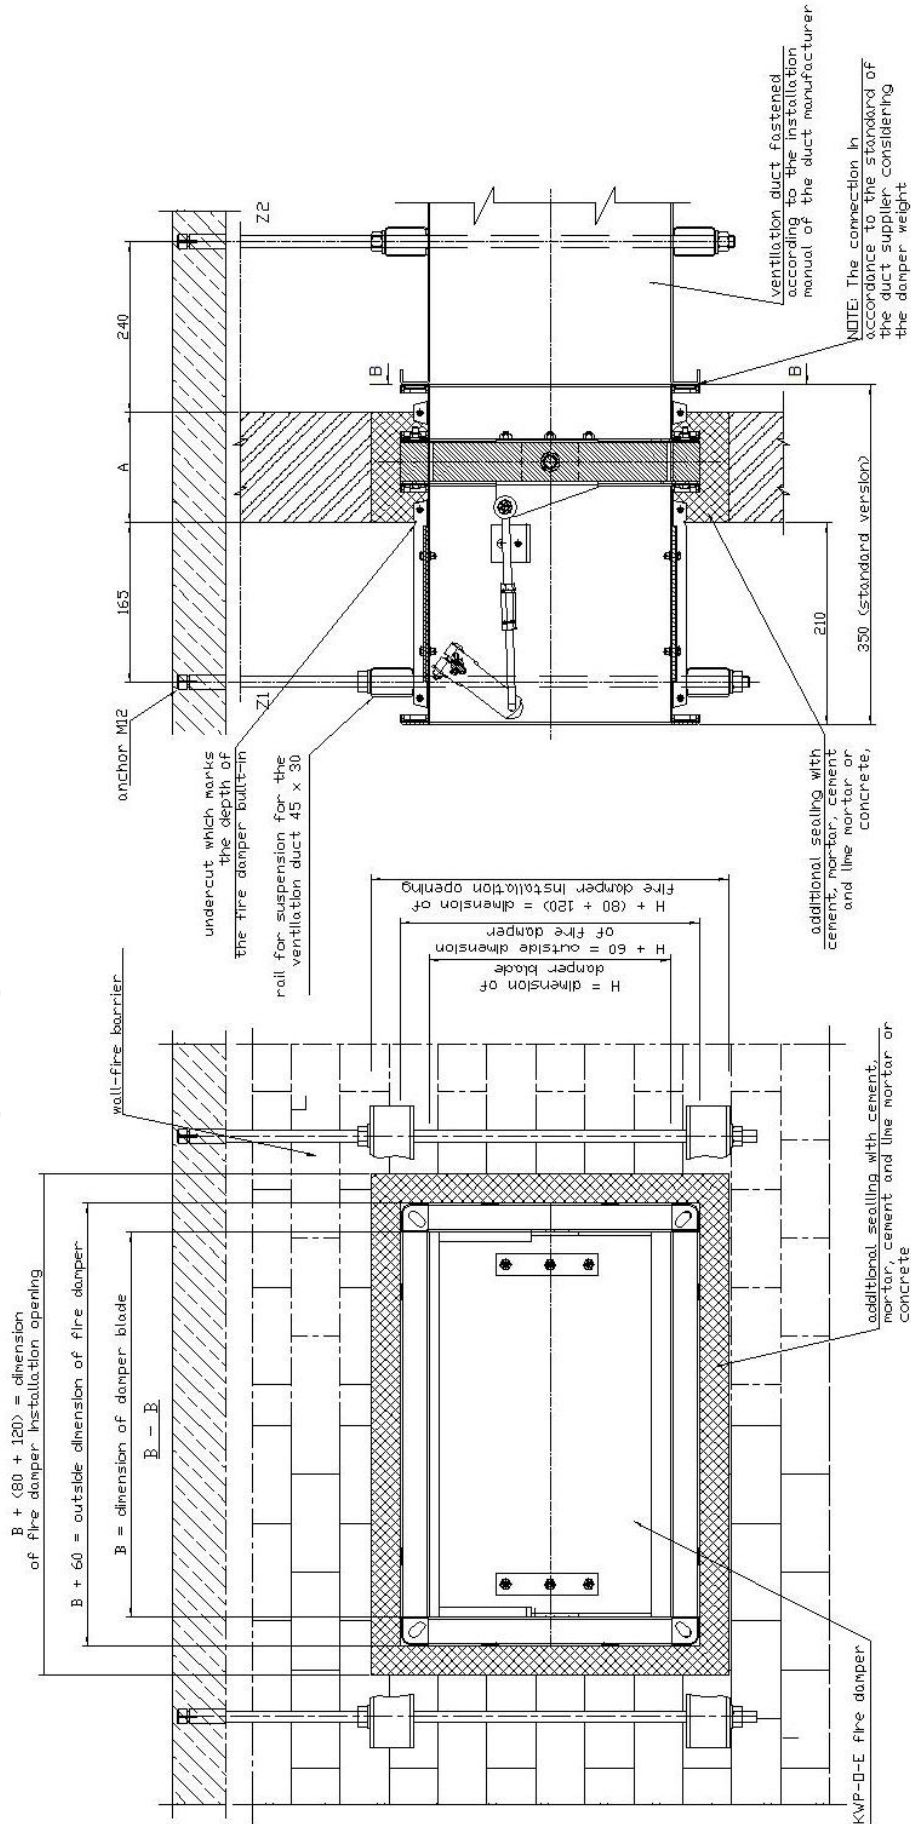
Installation method of fire dampers KWP-O in rigid wall
